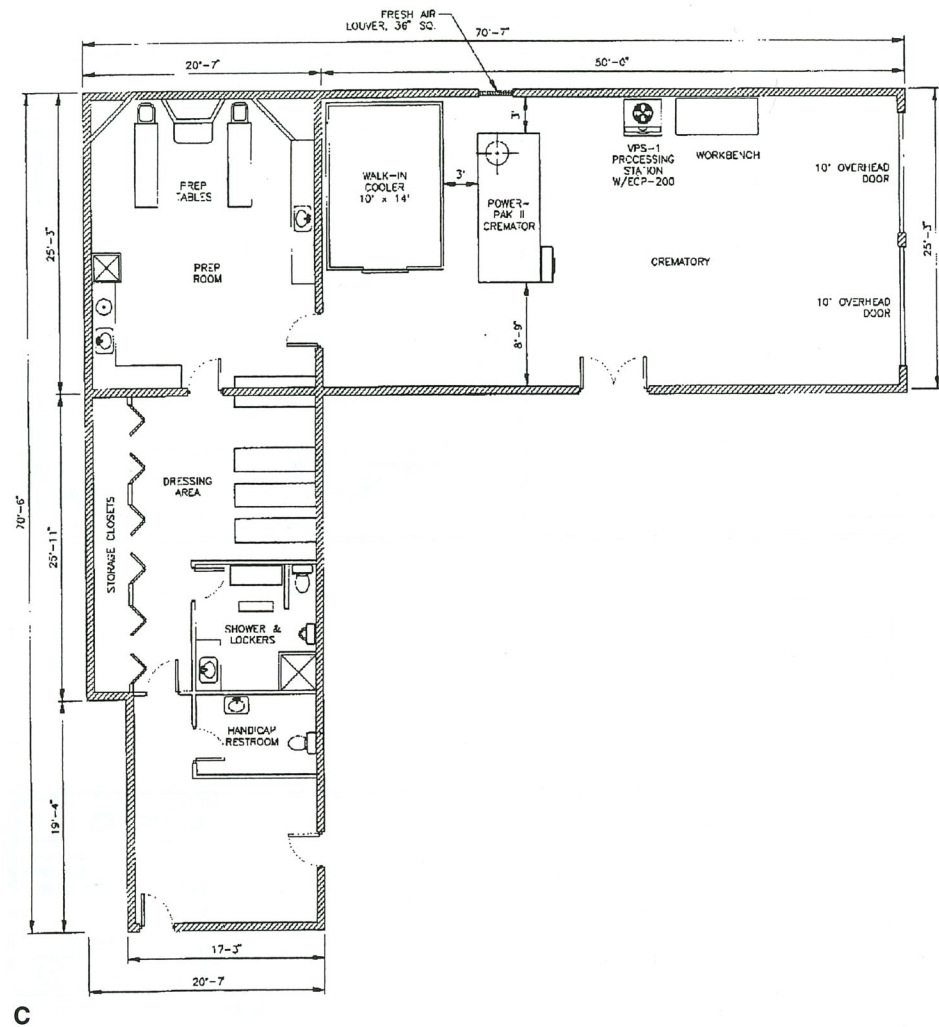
(Continued) C. Flooring plan suggested for central embalming facility or an embalming facility within a large funeral establishment.
